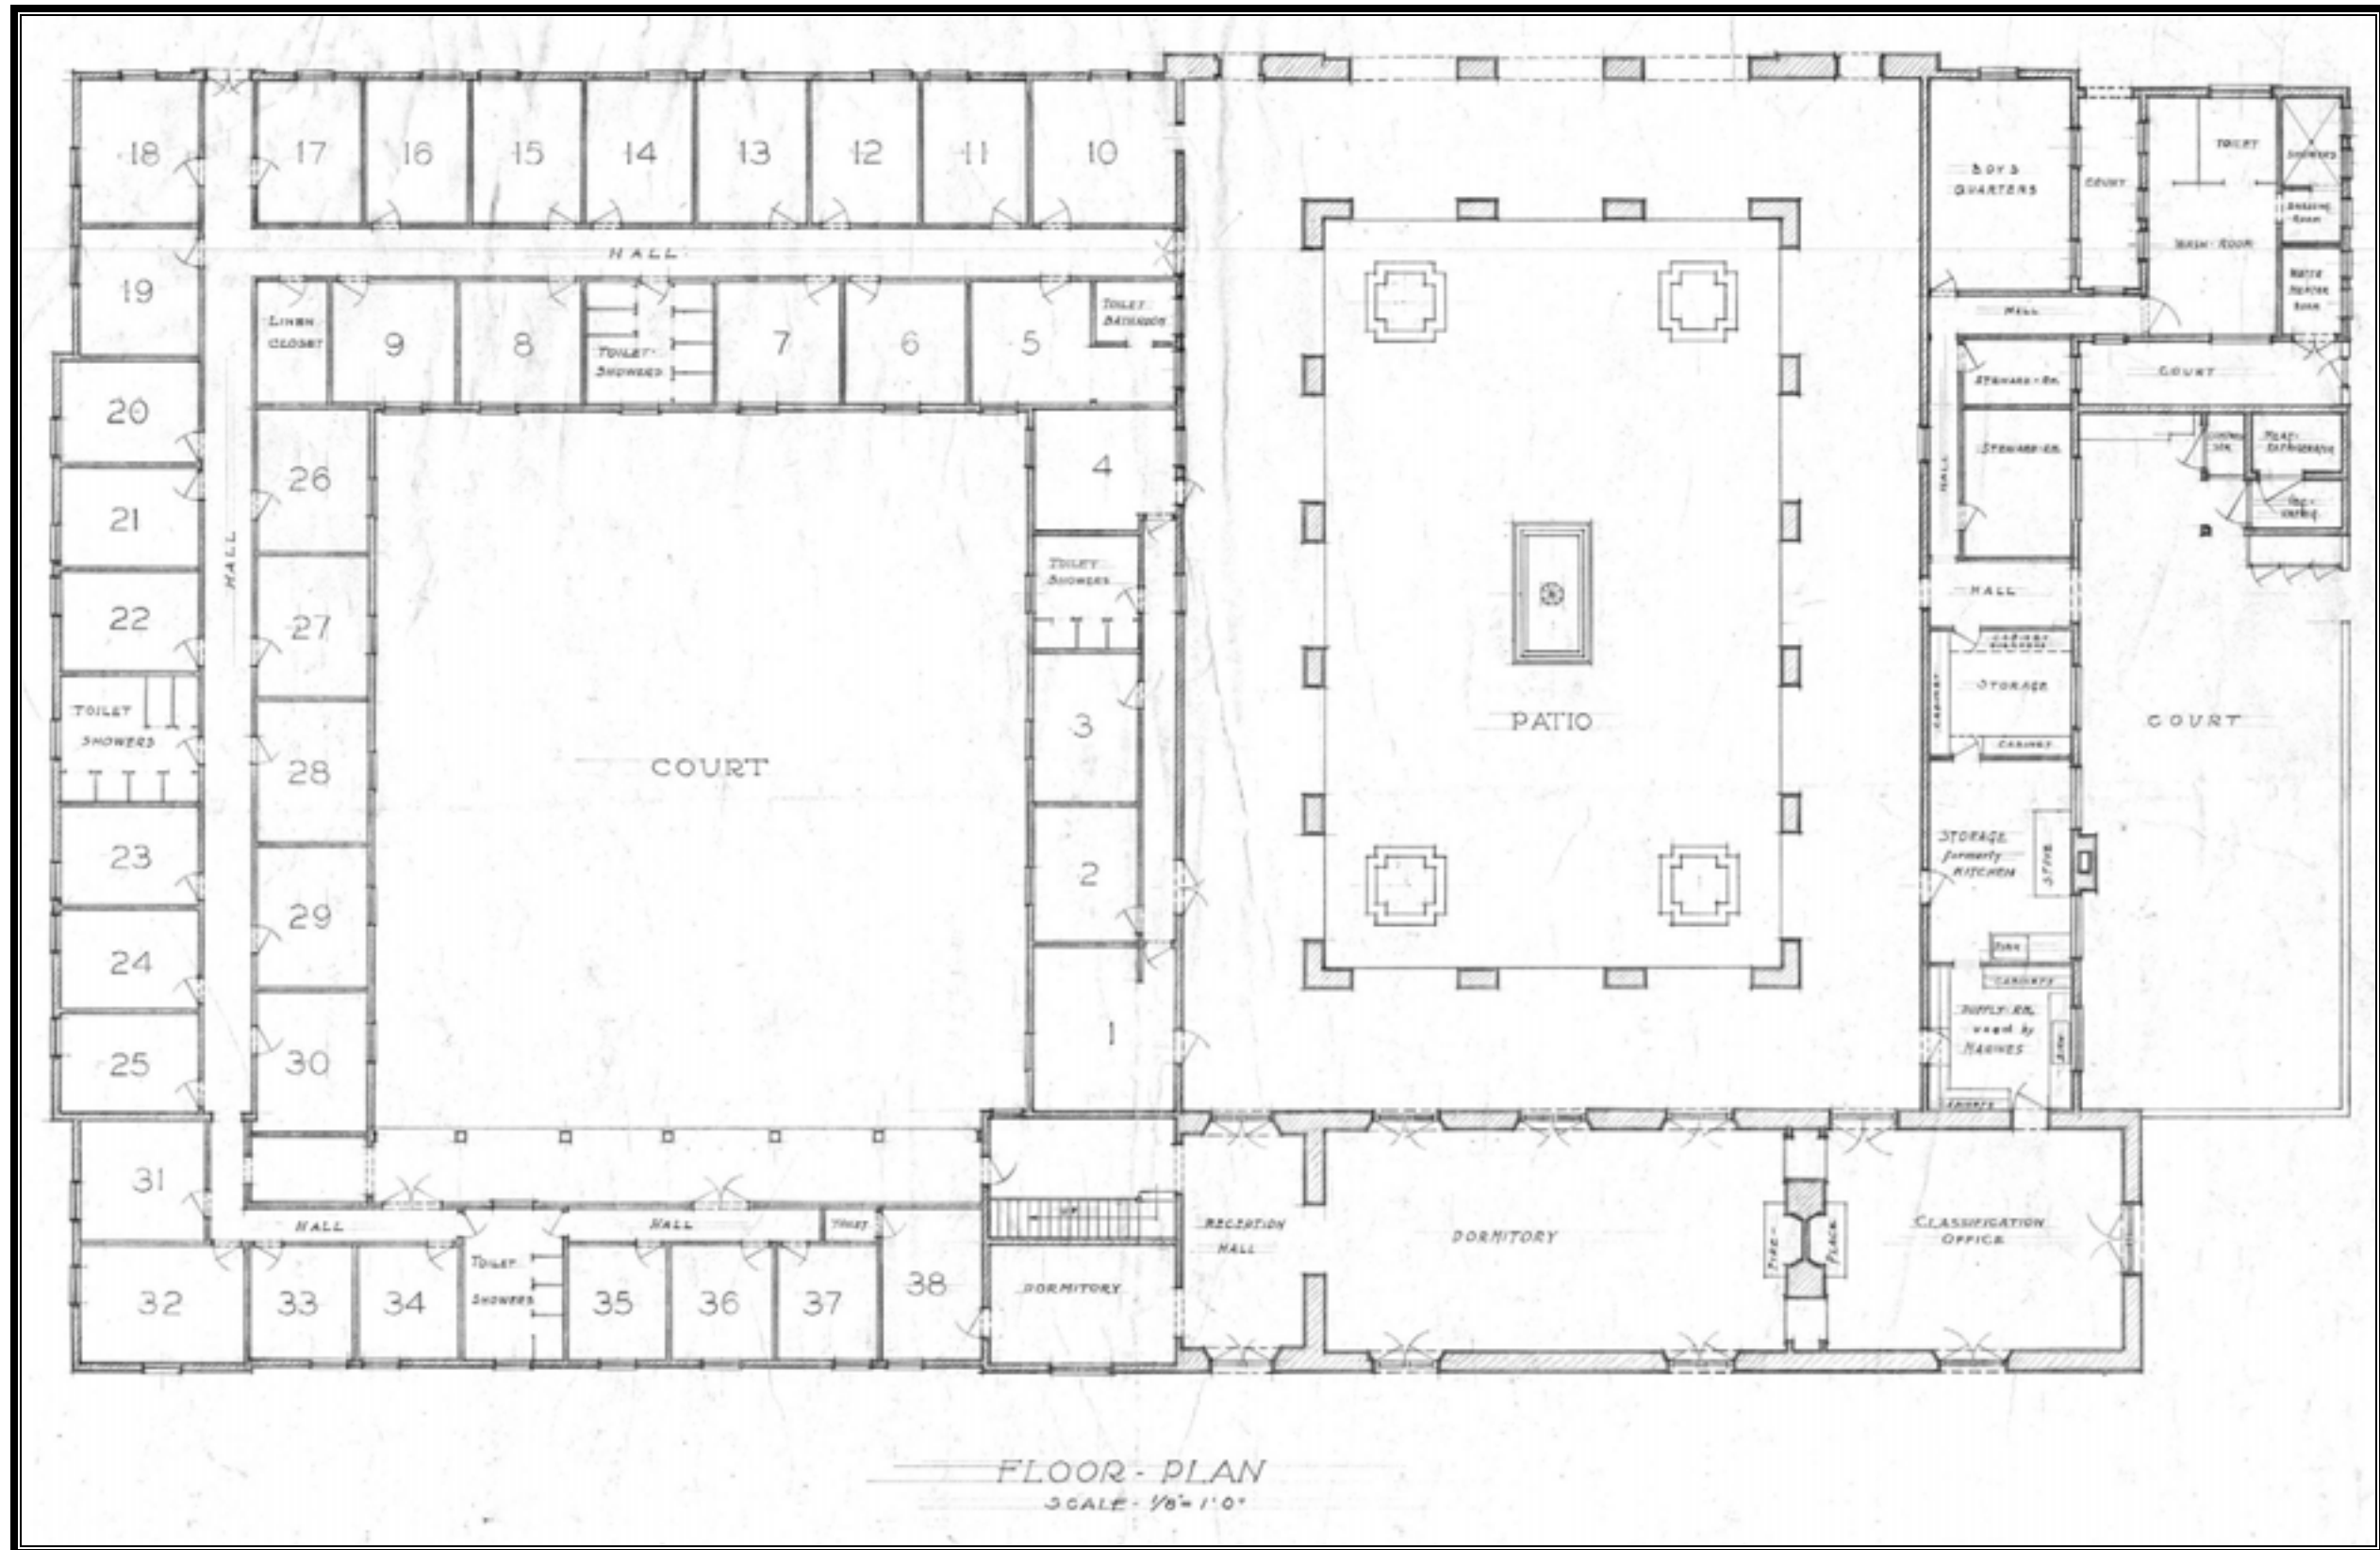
F-troop building, 1943 (Courtesy of Naval Air Station North Island)
